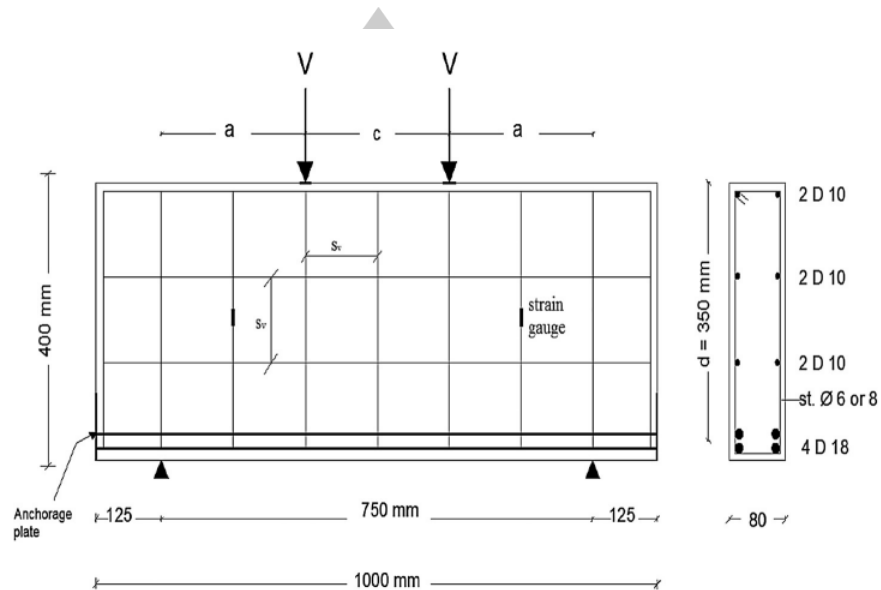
Details and Typical Cross Section of The Tested Beams (Yousef et al. [37]).
